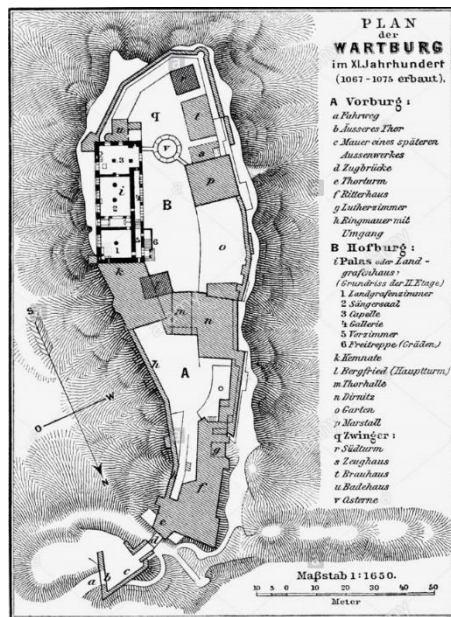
The fortified Wartburg Complex planning. The plan of the castle 2nd floor: 1 – Landgrave rooms (*Landgrafenzimmer*), 2 – The Singing Hall (*Sängersaal*), 3 – a chapel (*Capelle*), 4 – the gallery (*Gallerie*), 5 – anteroom (*Vorzimmer*), 6 – stairs (*Freitreppe (Gräden)*). (online 09.07.2017, source: <http://c8.alamy.com/comp/B5M5Y5/architecture-floor-plans-wartburg-thuringia-built-1067-1075-wood-engraving-B5M5Y5.jpg>)
